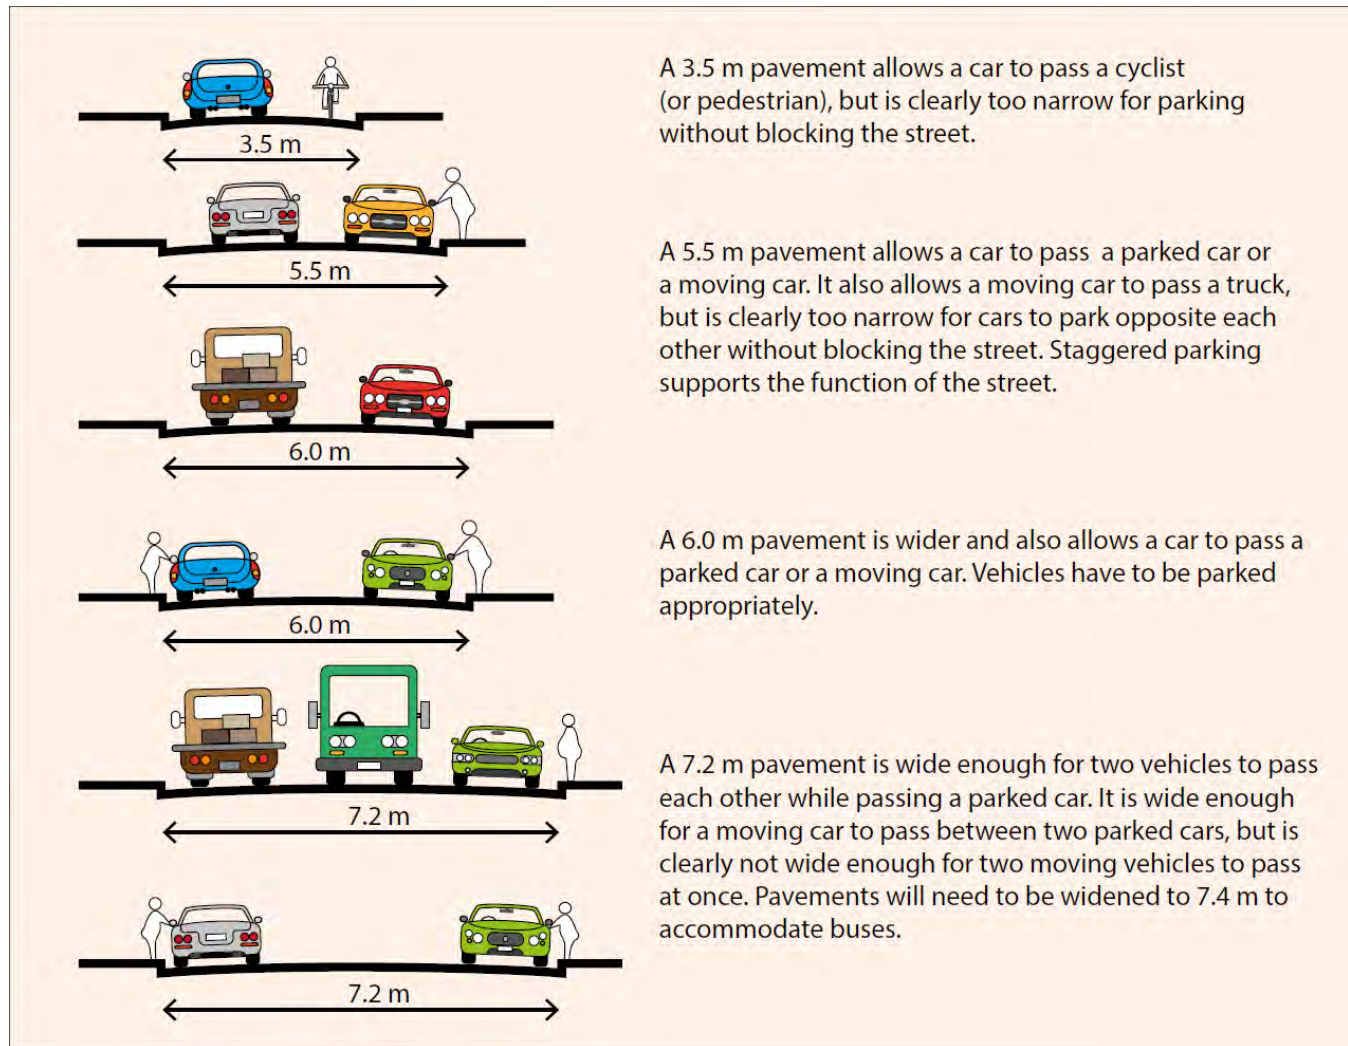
Diagram of Physical Determinations for the Width of Pavements in Access Streets (Source: WAPC)
